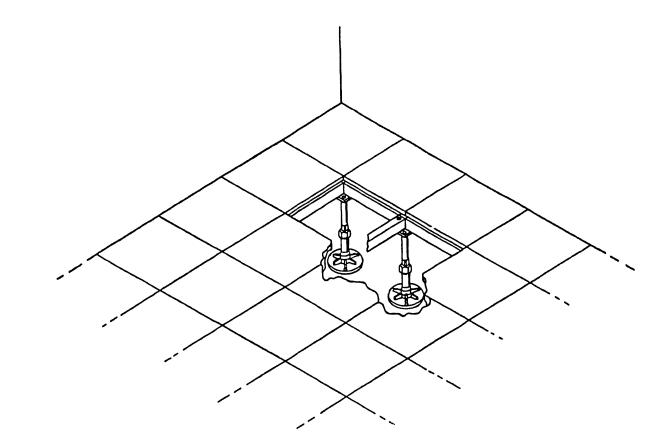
PEDESTAL-TYPE RAISED FLOORING
